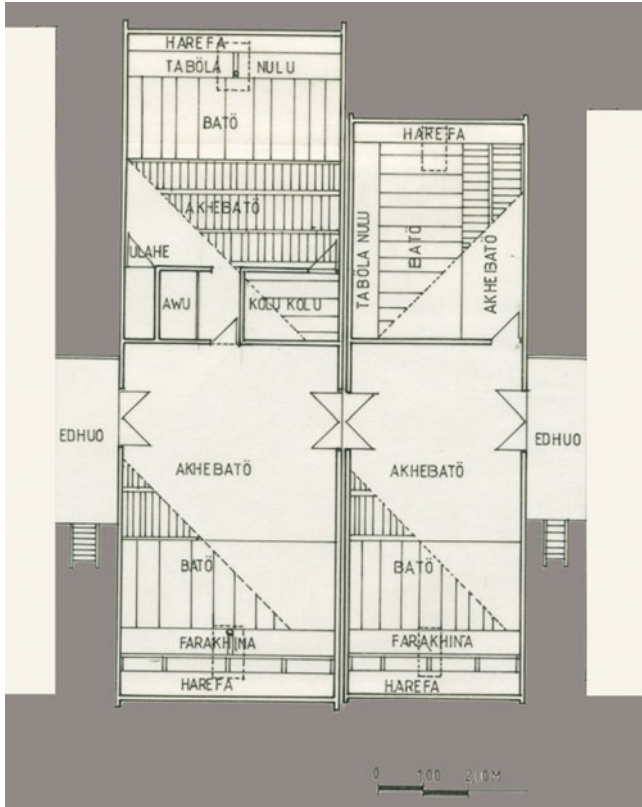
Floor plans of *omo hada* in the village of Bawömataluo
